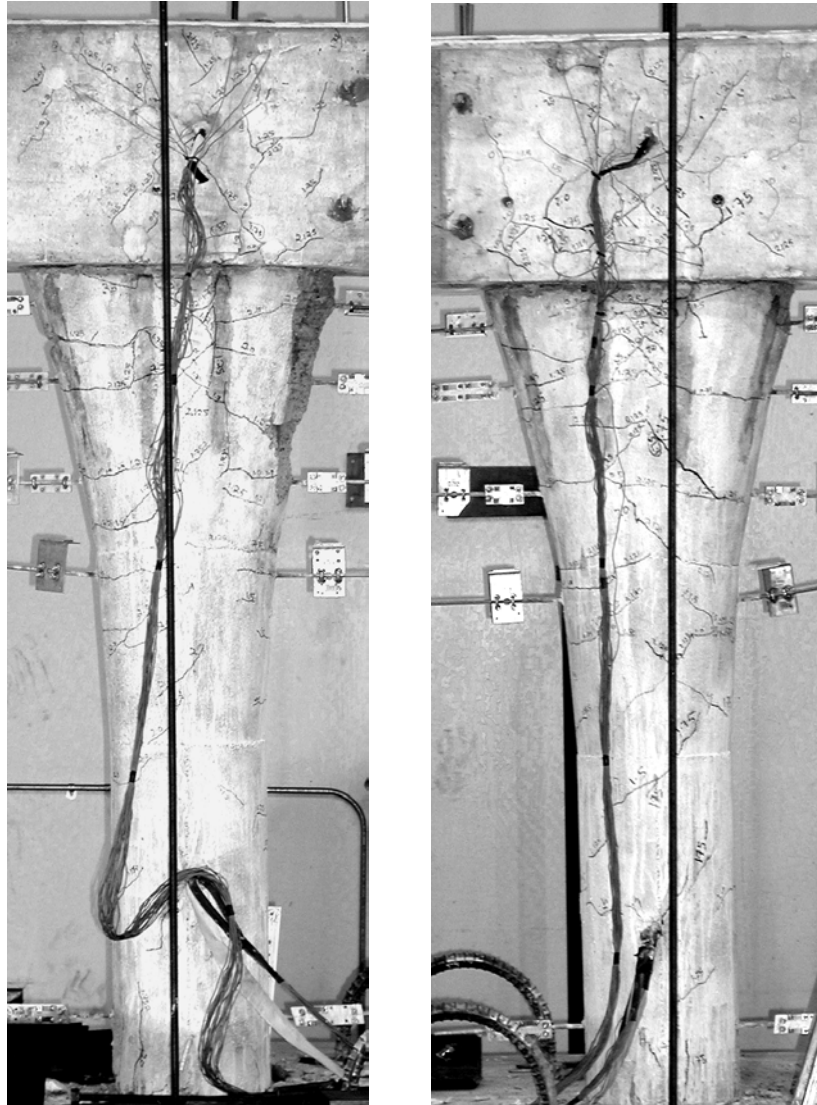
LFCD2 after Bucket Removal Column Cracks
